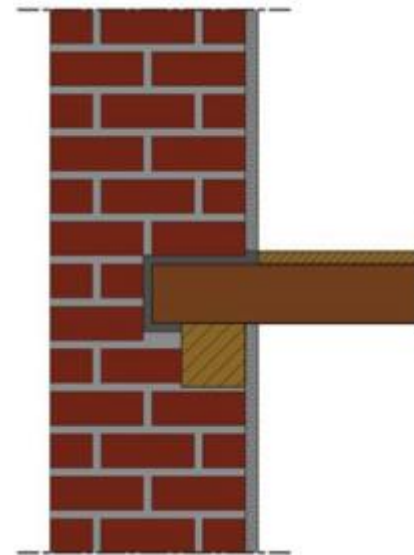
Danish construction used by [Harrestrup, M. 2016].
